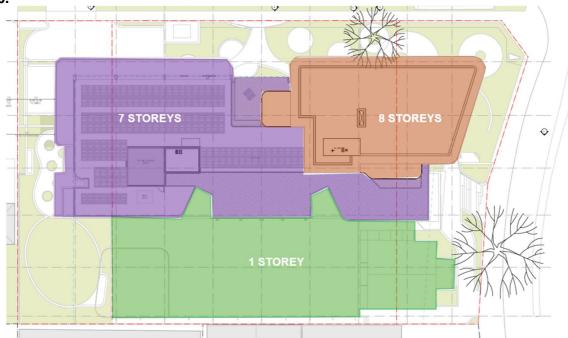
Proposed Built Form (Number of Storeys) (Source: plus architecture)
